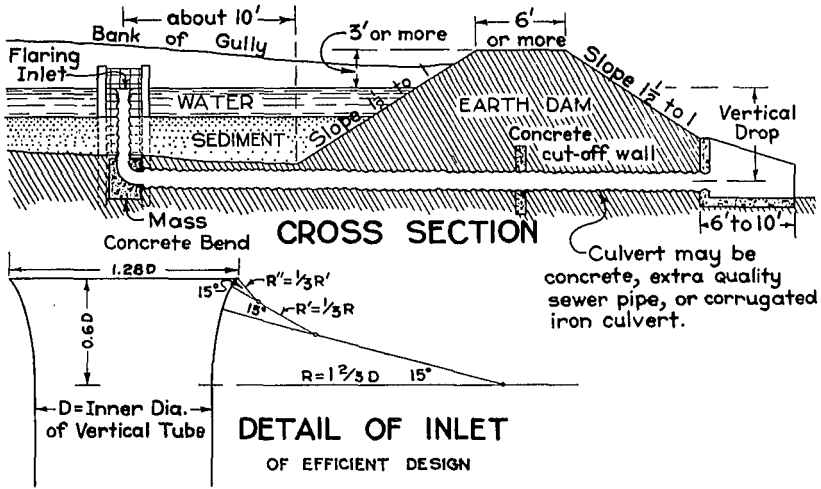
EARTH SOIL-SAVING DAM AND CULVERT WITH VERTICAL DROP INLET (ADAPTED FROM U.S.D.A., FARMERS BULLETIN 1234)
